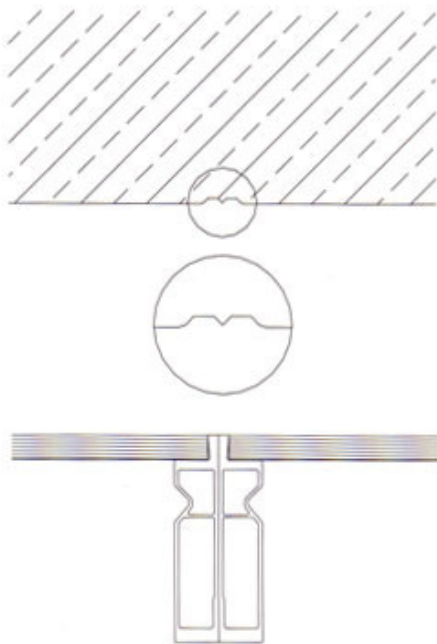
Negative impression in the concrete when using panels with a conventional plywood face
